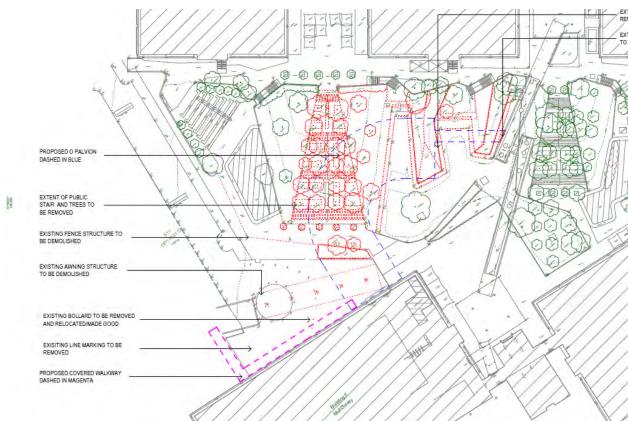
Extract of demolition plan showing location of new building (in blue outline) and stairs/structures being demolished in red.
